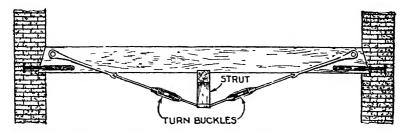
,603—Method of reinforcing joists with strut and tension rods to prevent sagging and resulting buckling of walls. *In design* make the strut of ample length to avoid undue tension in the rods
